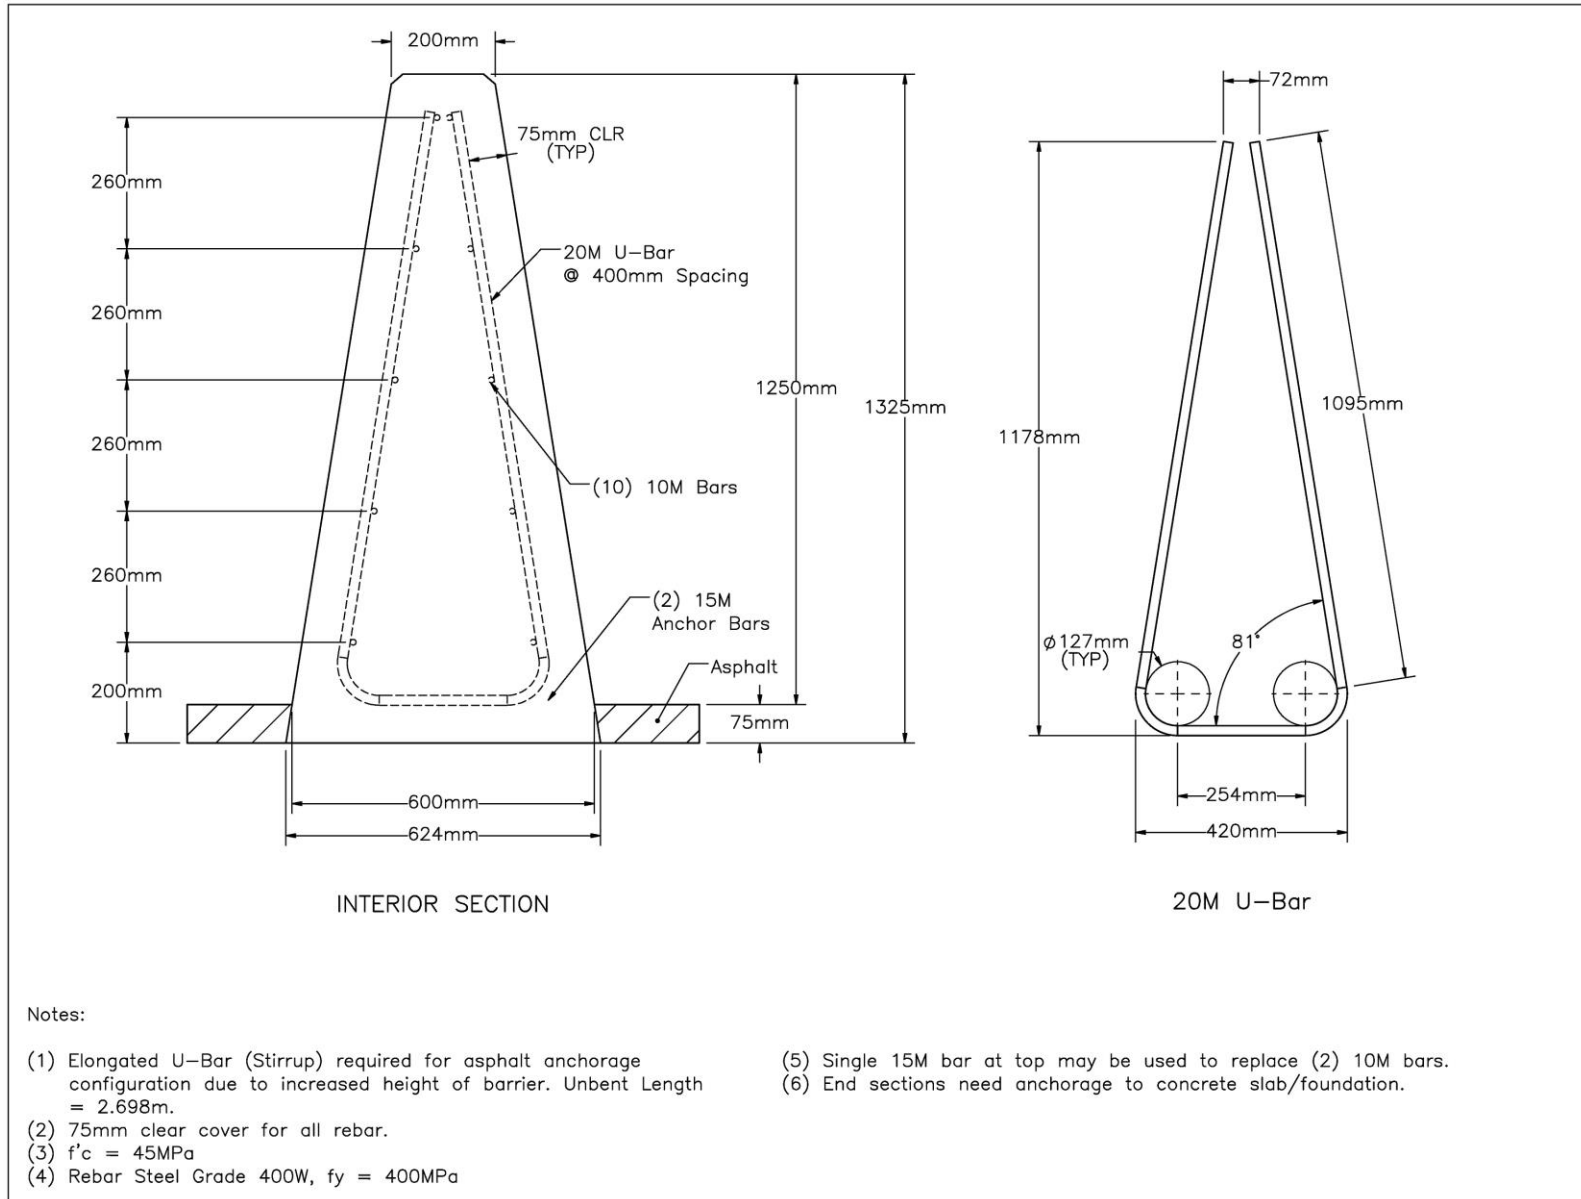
Asphalt Keyway Anchorage Details for Median Barrier Interior Sections
